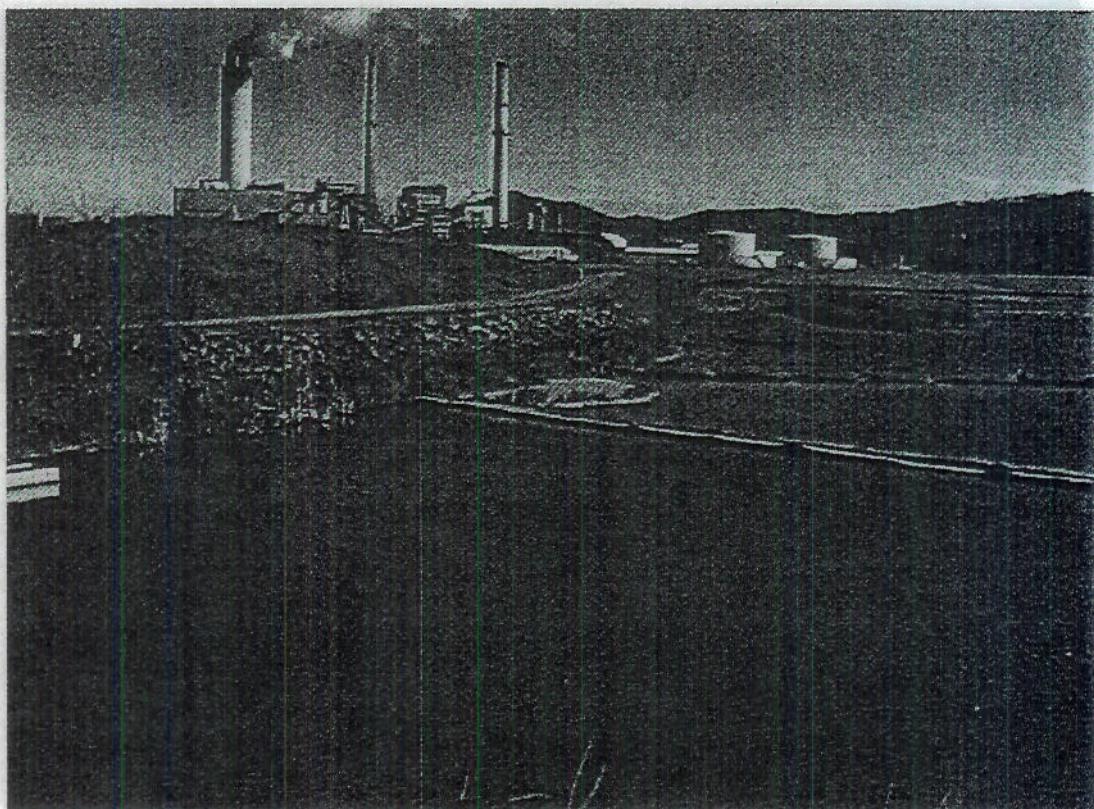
1964 Ash Pond – Outlet for drainage pipe installed beneath concrete flume.
